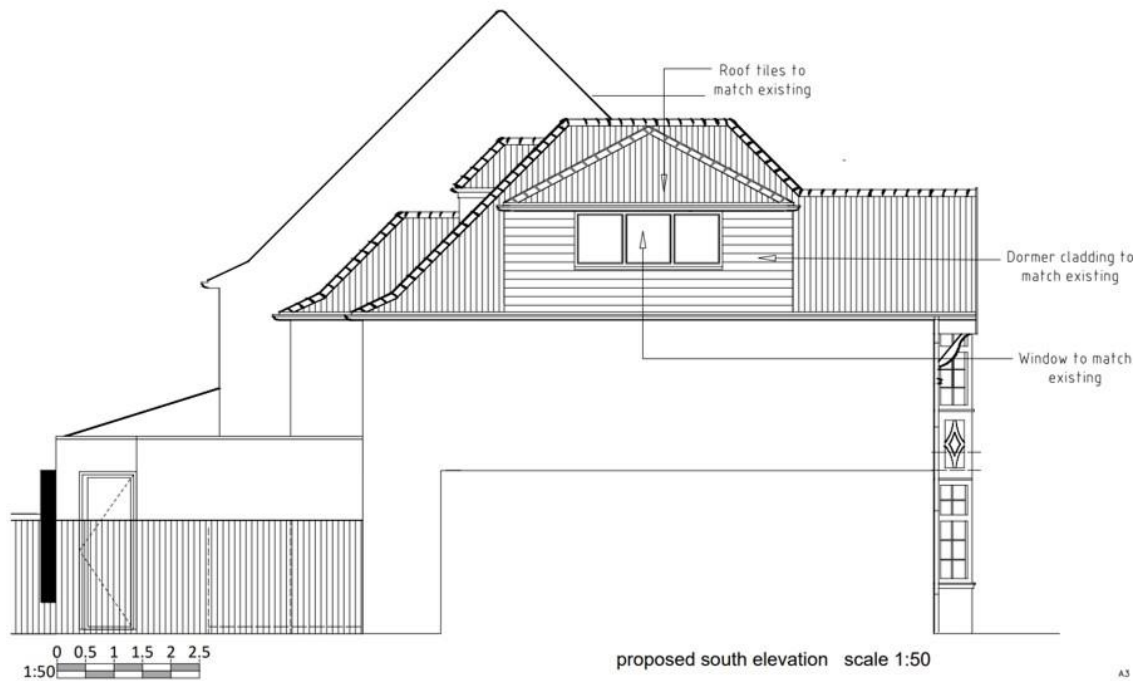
Side dormer windows are a common fixture in Hillway, with many neighbouring dwellings having them. The proposal is minor in nature and would not adversely impact the wider area.
